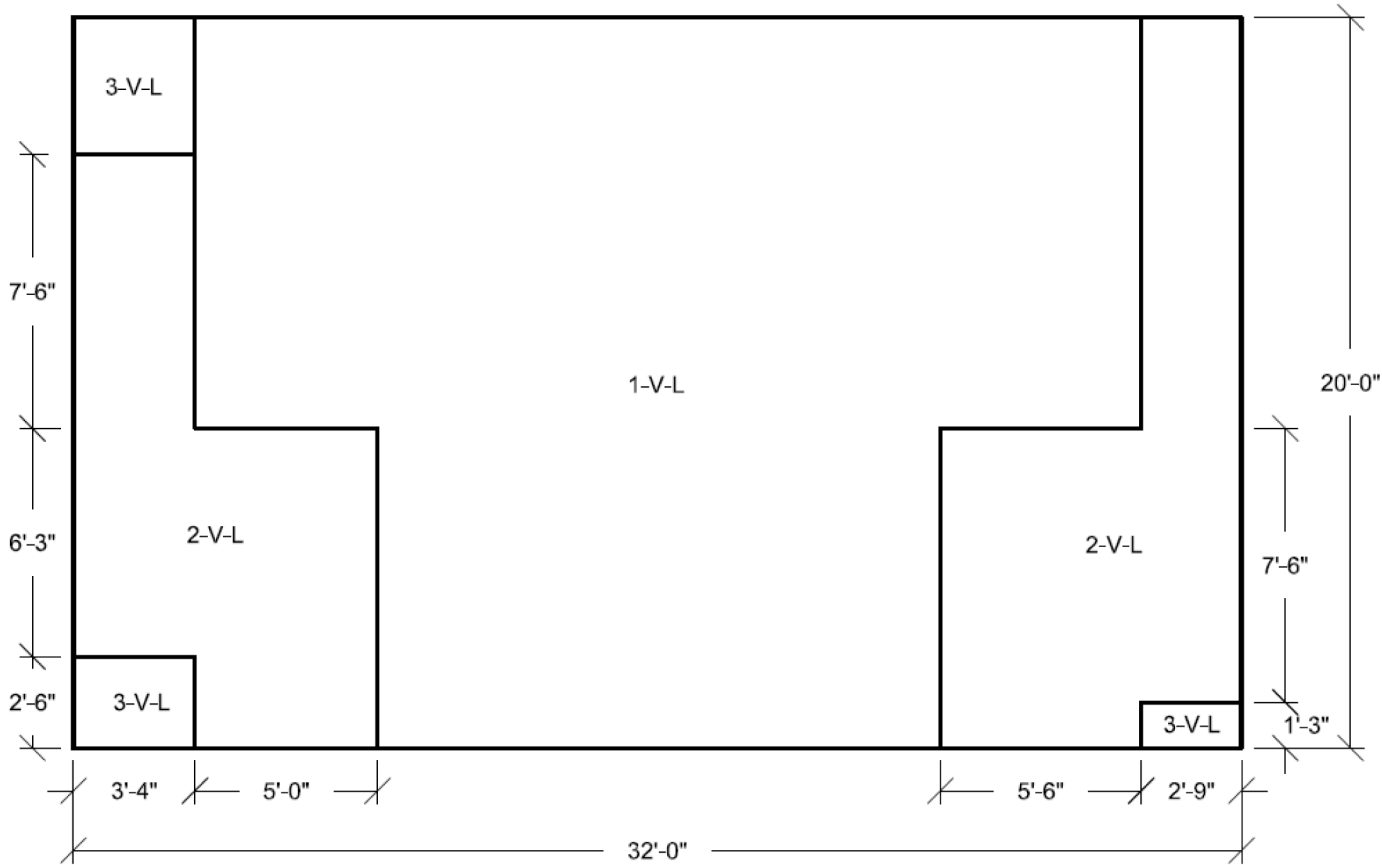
H.6-201 DGFOV Wall 15 Looking From Outside
